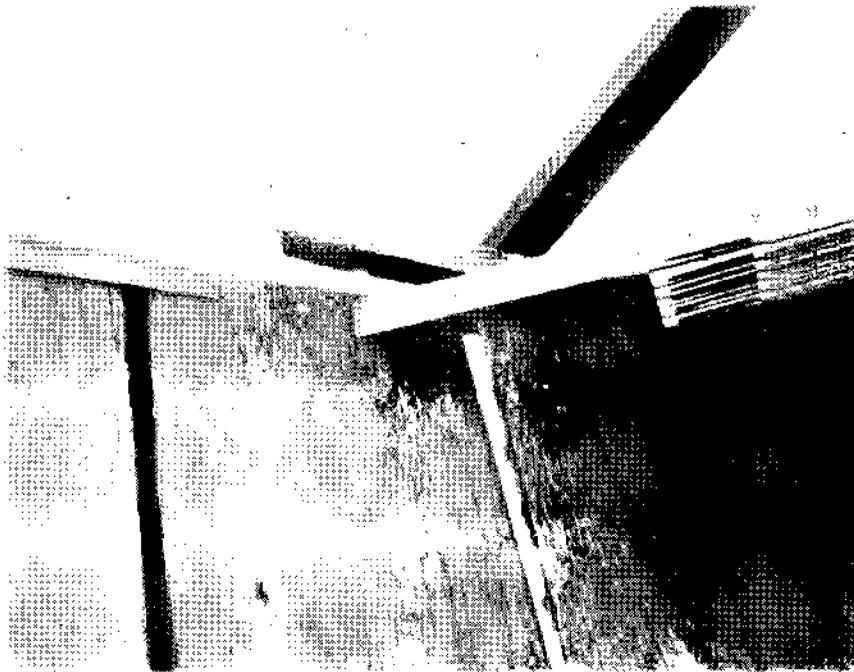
Loose Interior Paneling to Wall Framing Attachment
